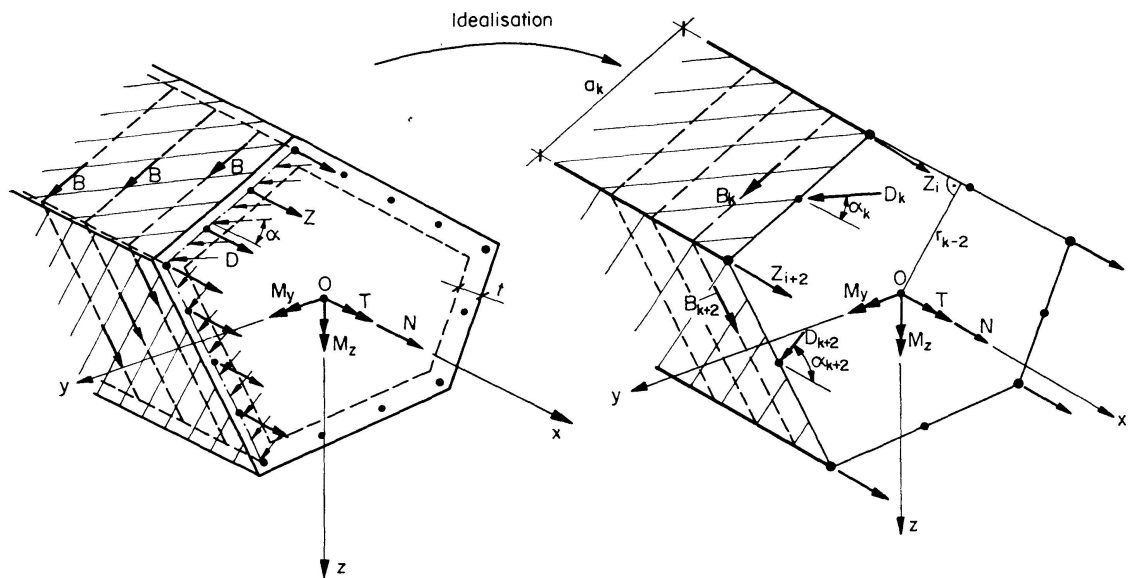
Failure Model - Space Truss with Variable Inclination of the Diagonals
